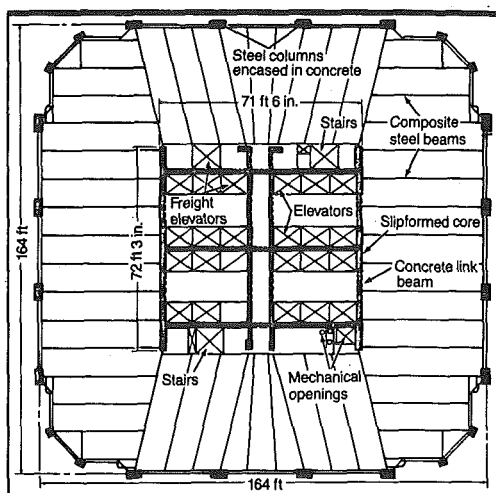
Link Beams Shown in Typical Framing Hold Half of Core's Rebar
